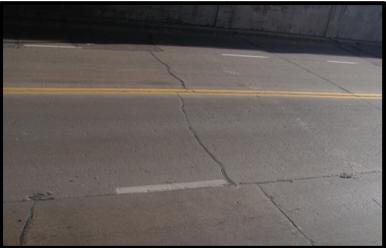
Typical Eddy Street Underpass transverse cracks.
